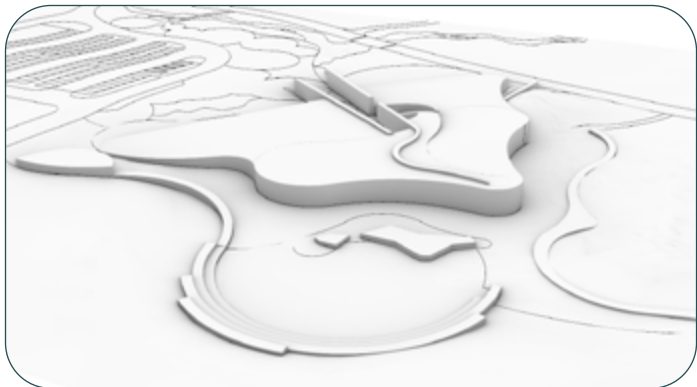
View 3 - Elevated view looking at the northern elevation of the building from the ceremonial space
